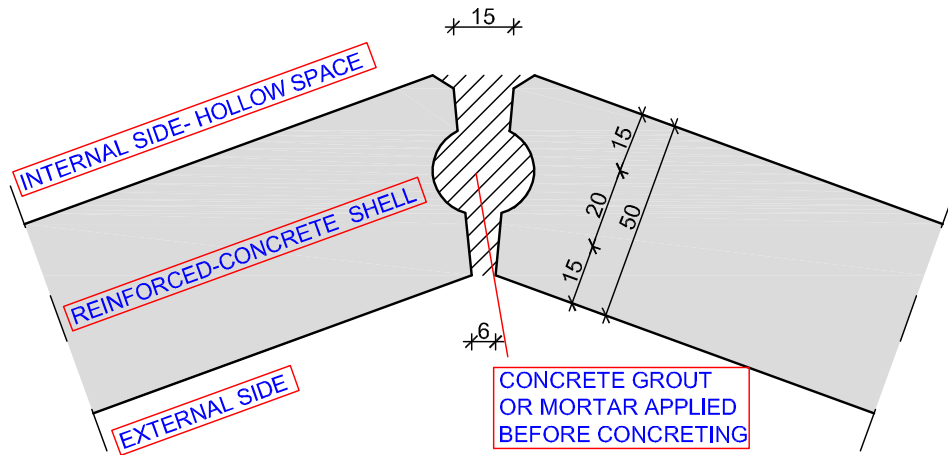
Concreting grout or mortar as sealing for inner vertical joint [mm]
